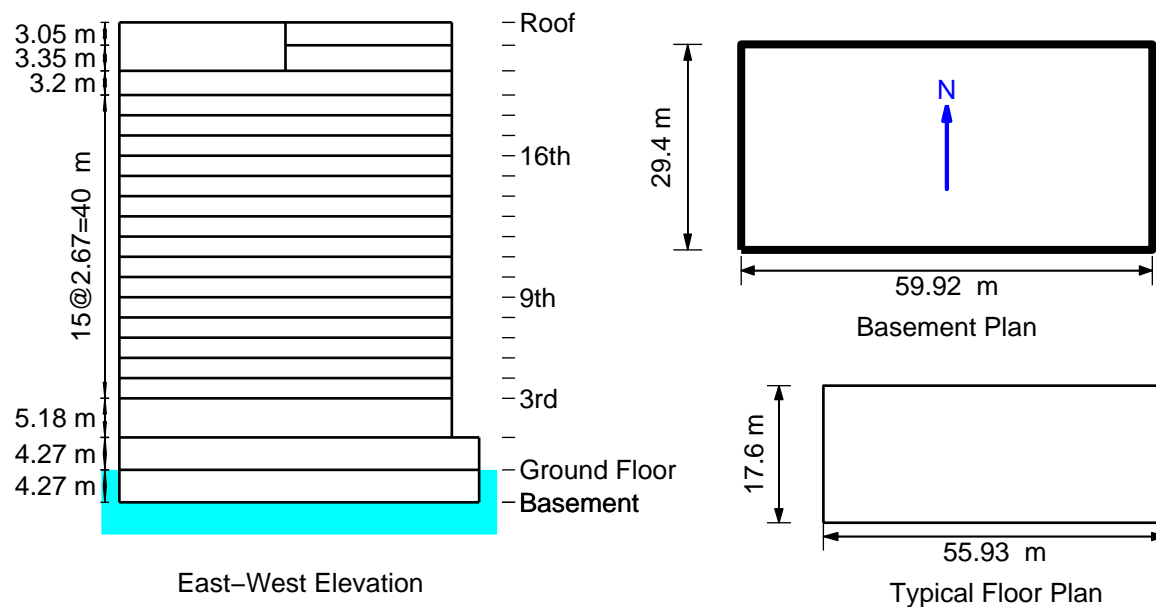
Elevation and plan of 20-Story Hotel in North Hollywood.
